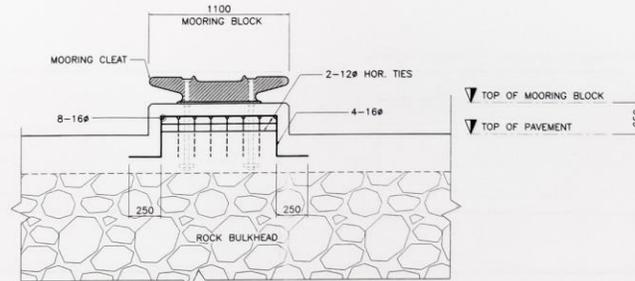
DETAIL OF R.C. CURB @ ROCK BULKHEAD
